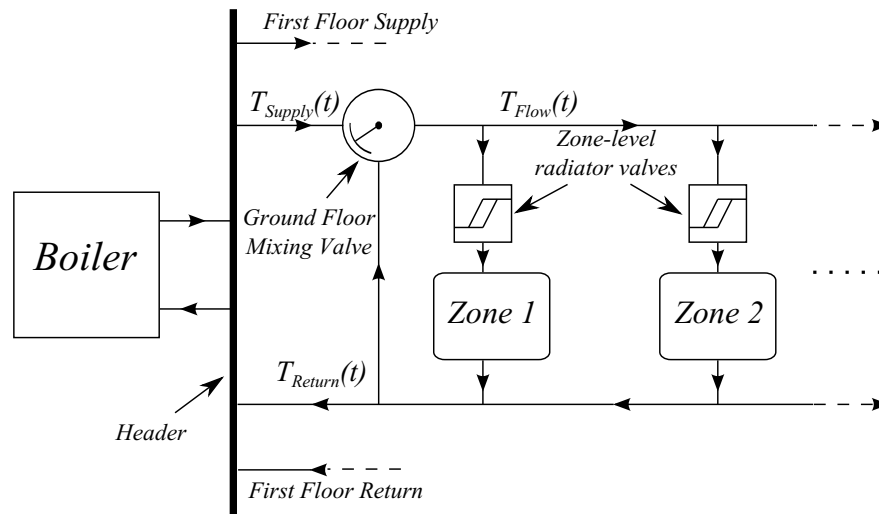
Schematic of ground floor section of heating system used in the Nimbus Centre
